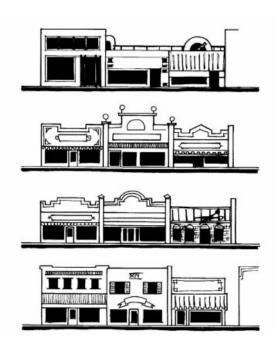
Adopt a greater level of design for downtown business facades either as modern or traditional styles, but all adding to the benefit of the streetscape.
